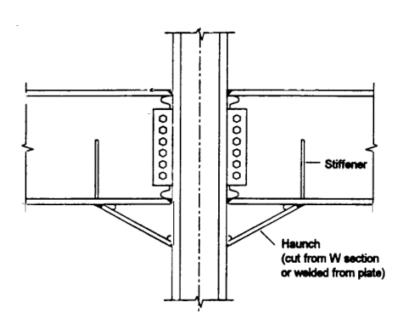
Welded Haunch Connection
